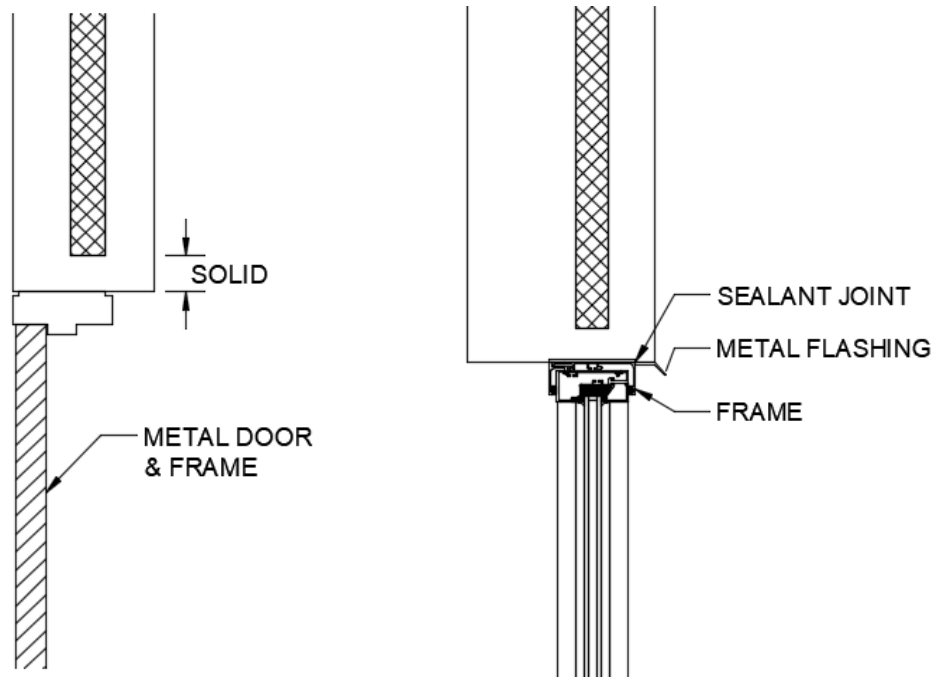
Sample of structurally sound details resulting in thermal bridging around windows and doors
